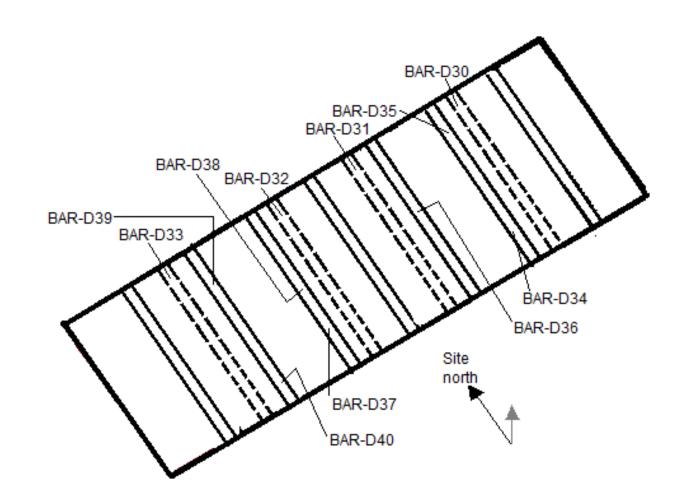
Sketch plan of the Barn, showing the location of samples BAR-D30–40
